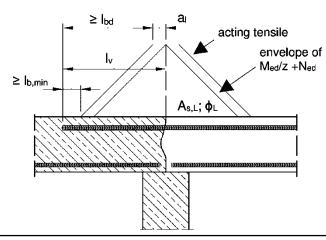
Overlapping joint for rebar connections of slabs and beams
